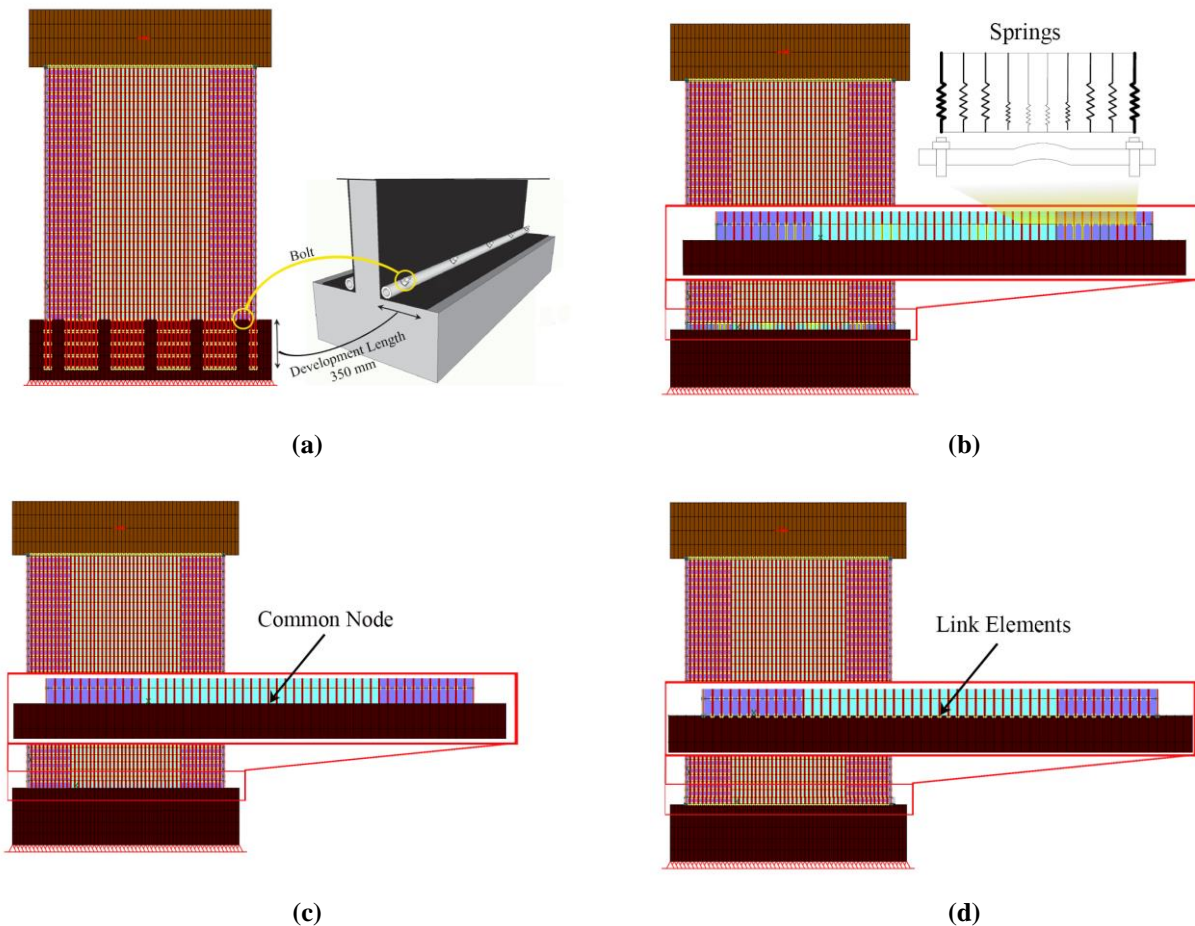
Different approaches used to model anchorage system: (a) FRP trusses continued to the foundation block, (b) elastic springs were used between the bolts, (c) perfect bond assumed at the junction of the wall and foundation, (d) Imperfect bond assumed at the junction
